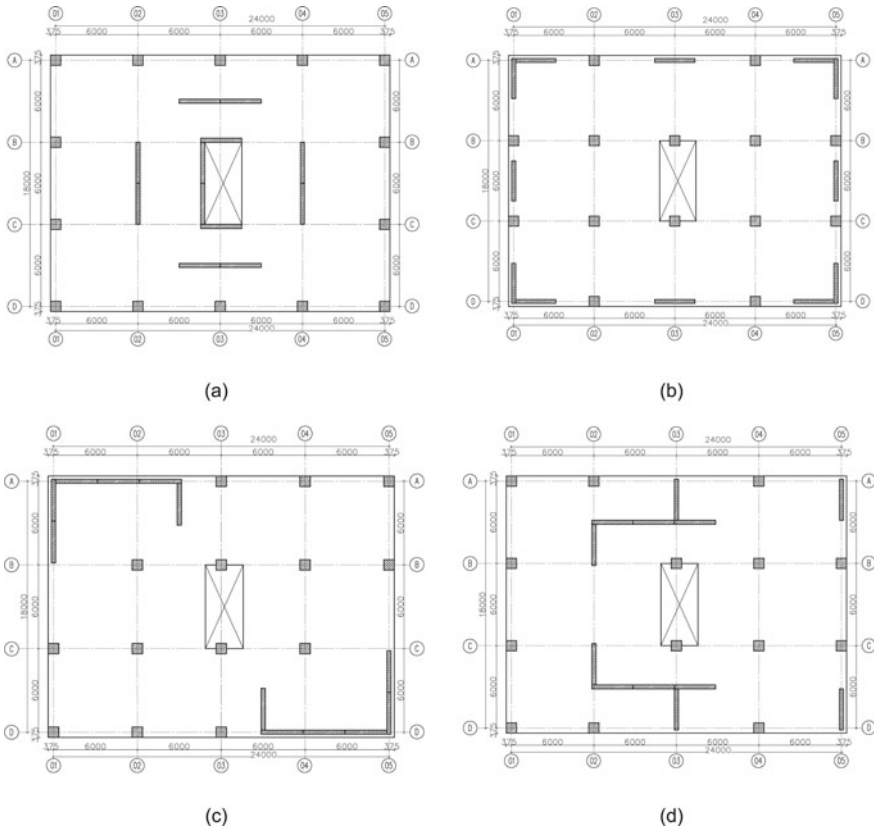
Structural plan view of a Scenario 1, b Scenario 2, c Scenario 3, and d Scenario 4
